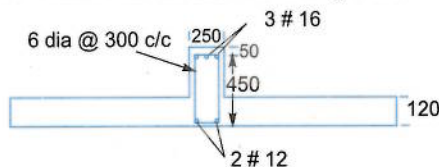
The cross sectional details of inverted cantilever beam.
